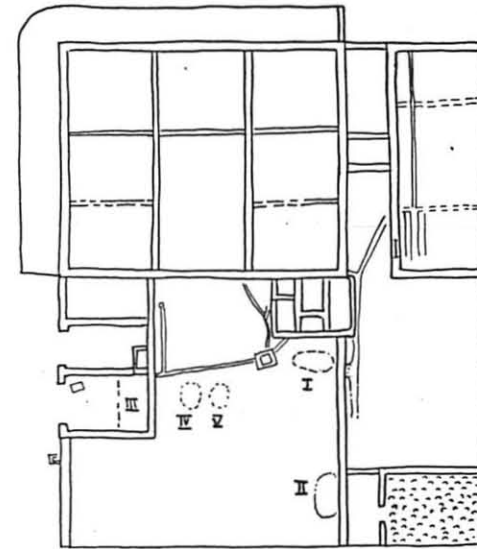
Groundplan of the structures, and features on the site by the early 20th century.
